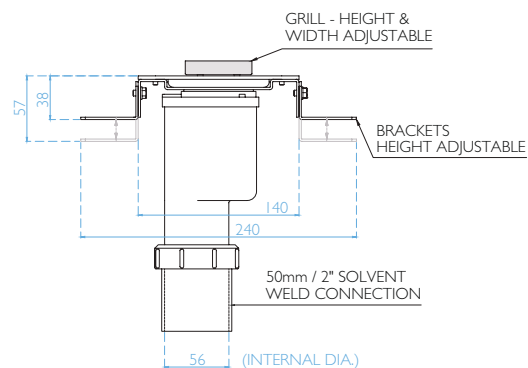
# DETAIL: VERTICAL TRAP - FLOOR GRILL
